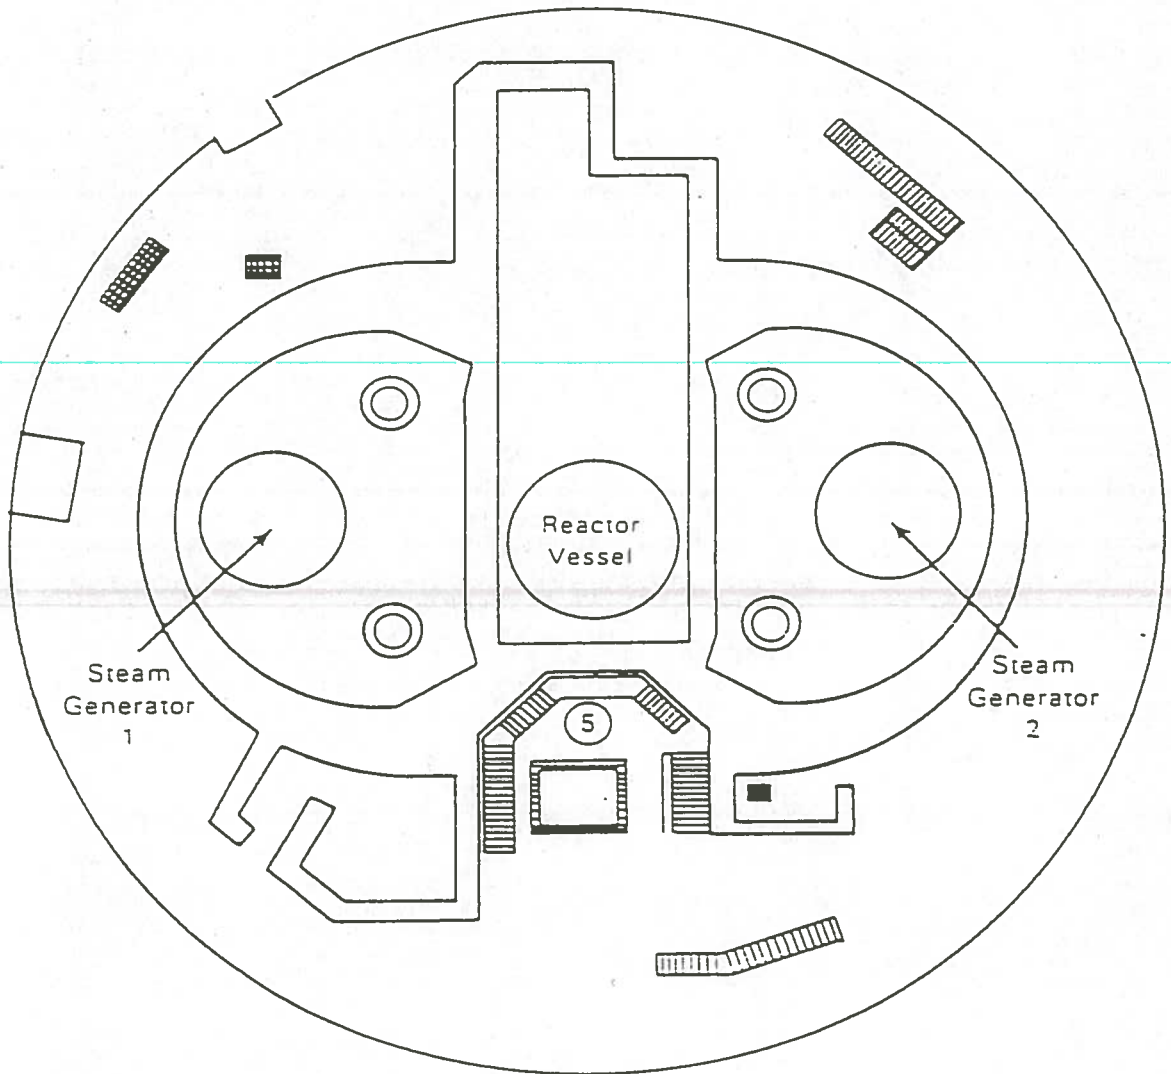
Physical Layout of the D-rings Inside the Containment Structure at the +21 ft. Elevation
